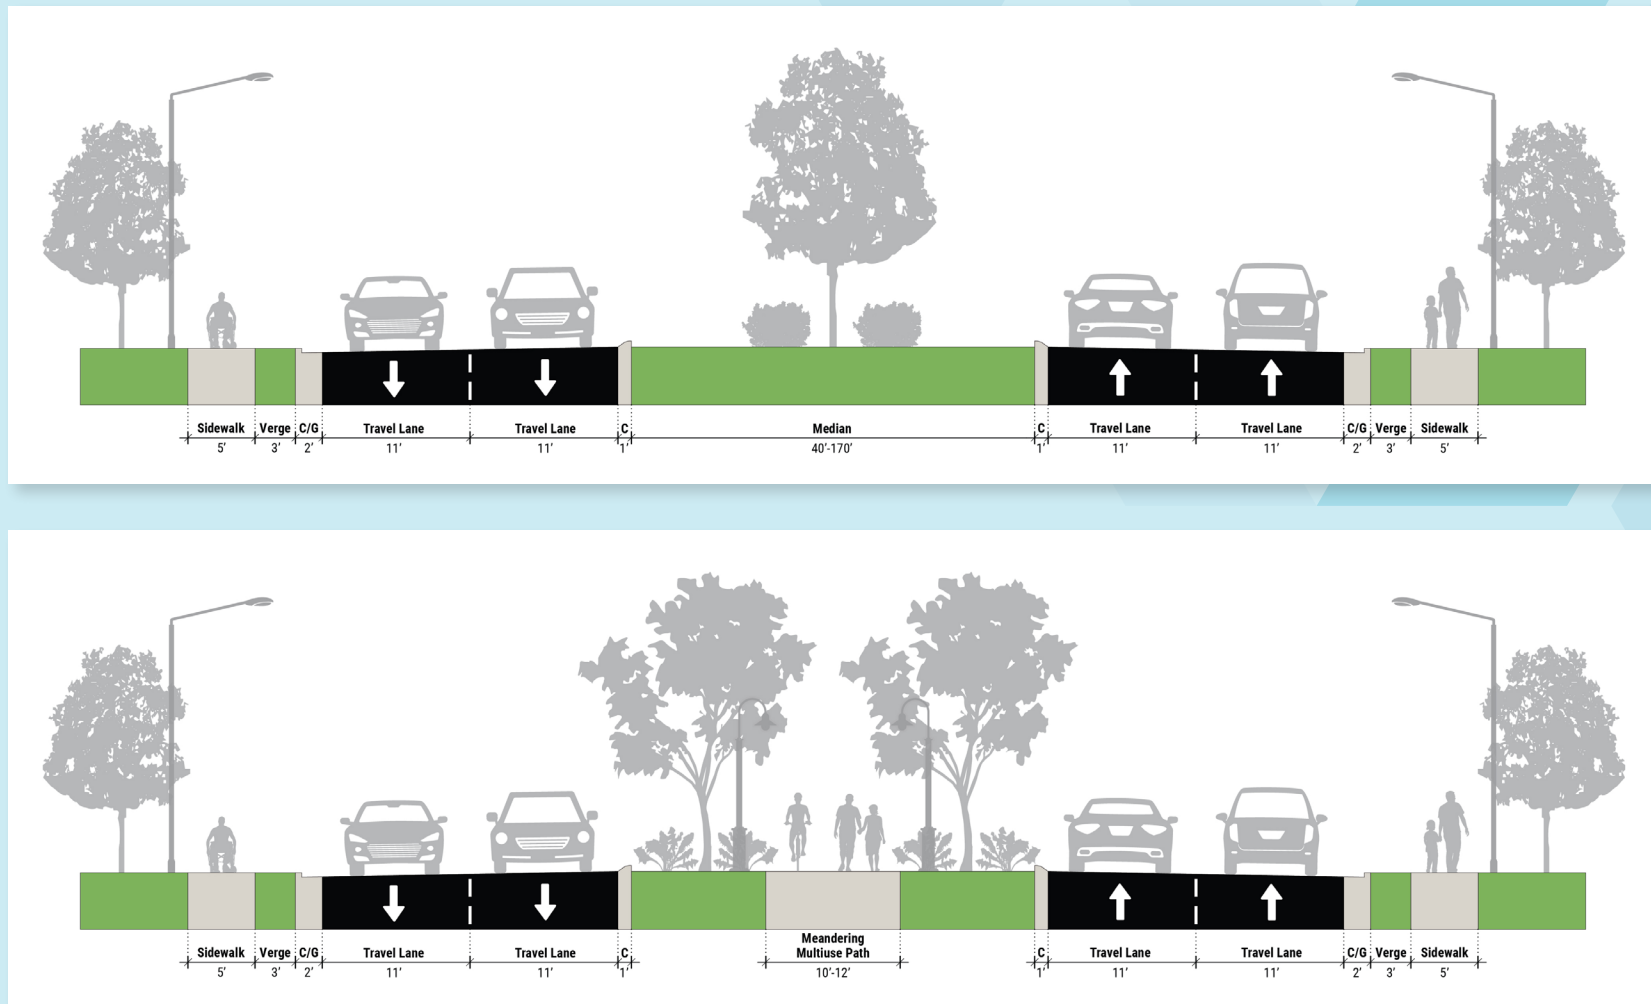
ALLS OF NEUSE ROAD SECTION
